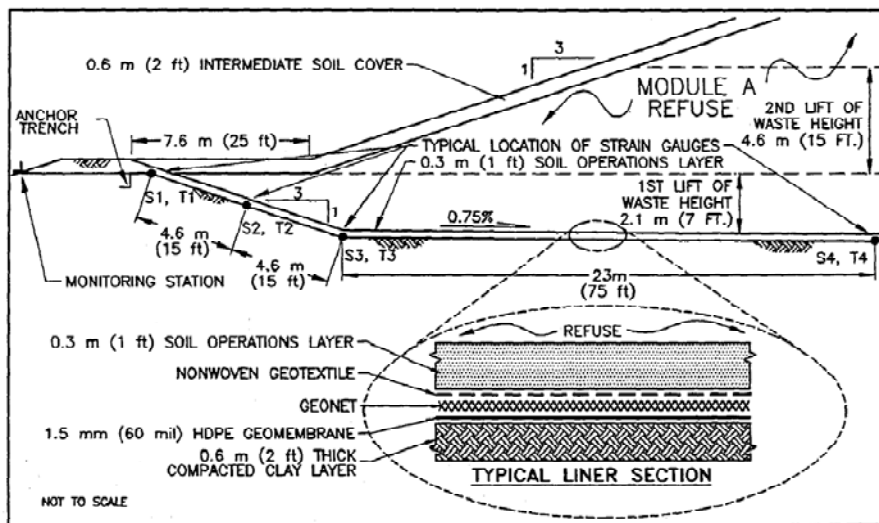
Typical Cross-Section of the Instrumented Landfill liner (Yazdani et al. 1995)
